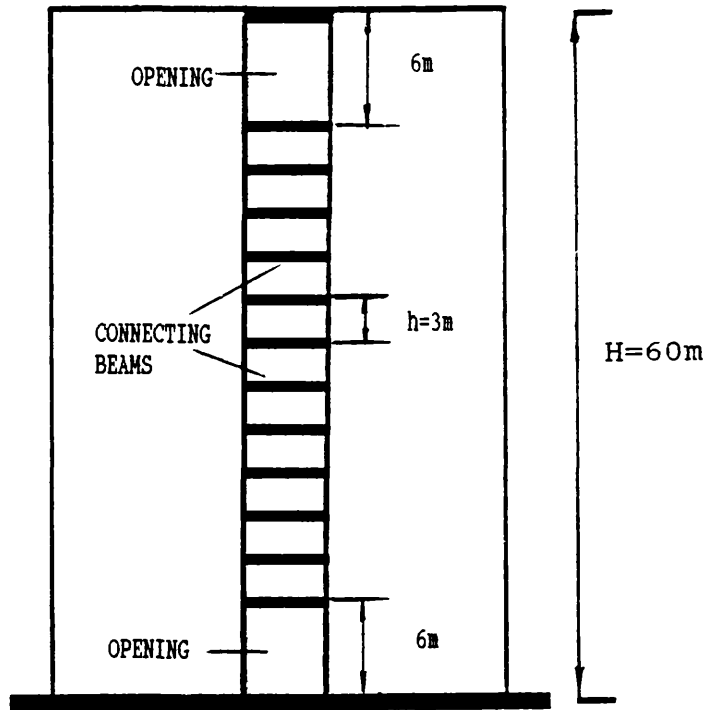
EXAMPLE STRUCTURE, ELEVATION
